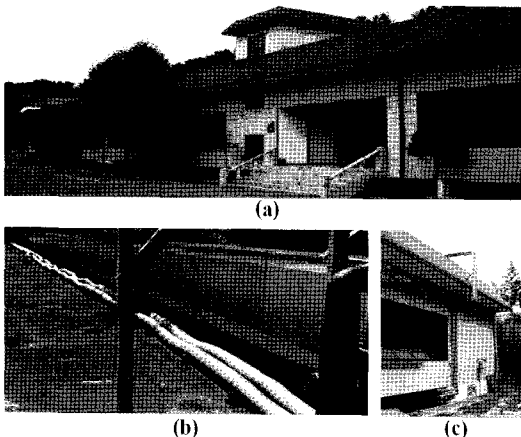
Photographs of (a) the test building, (b) horizontal and (c) vertical piping.
